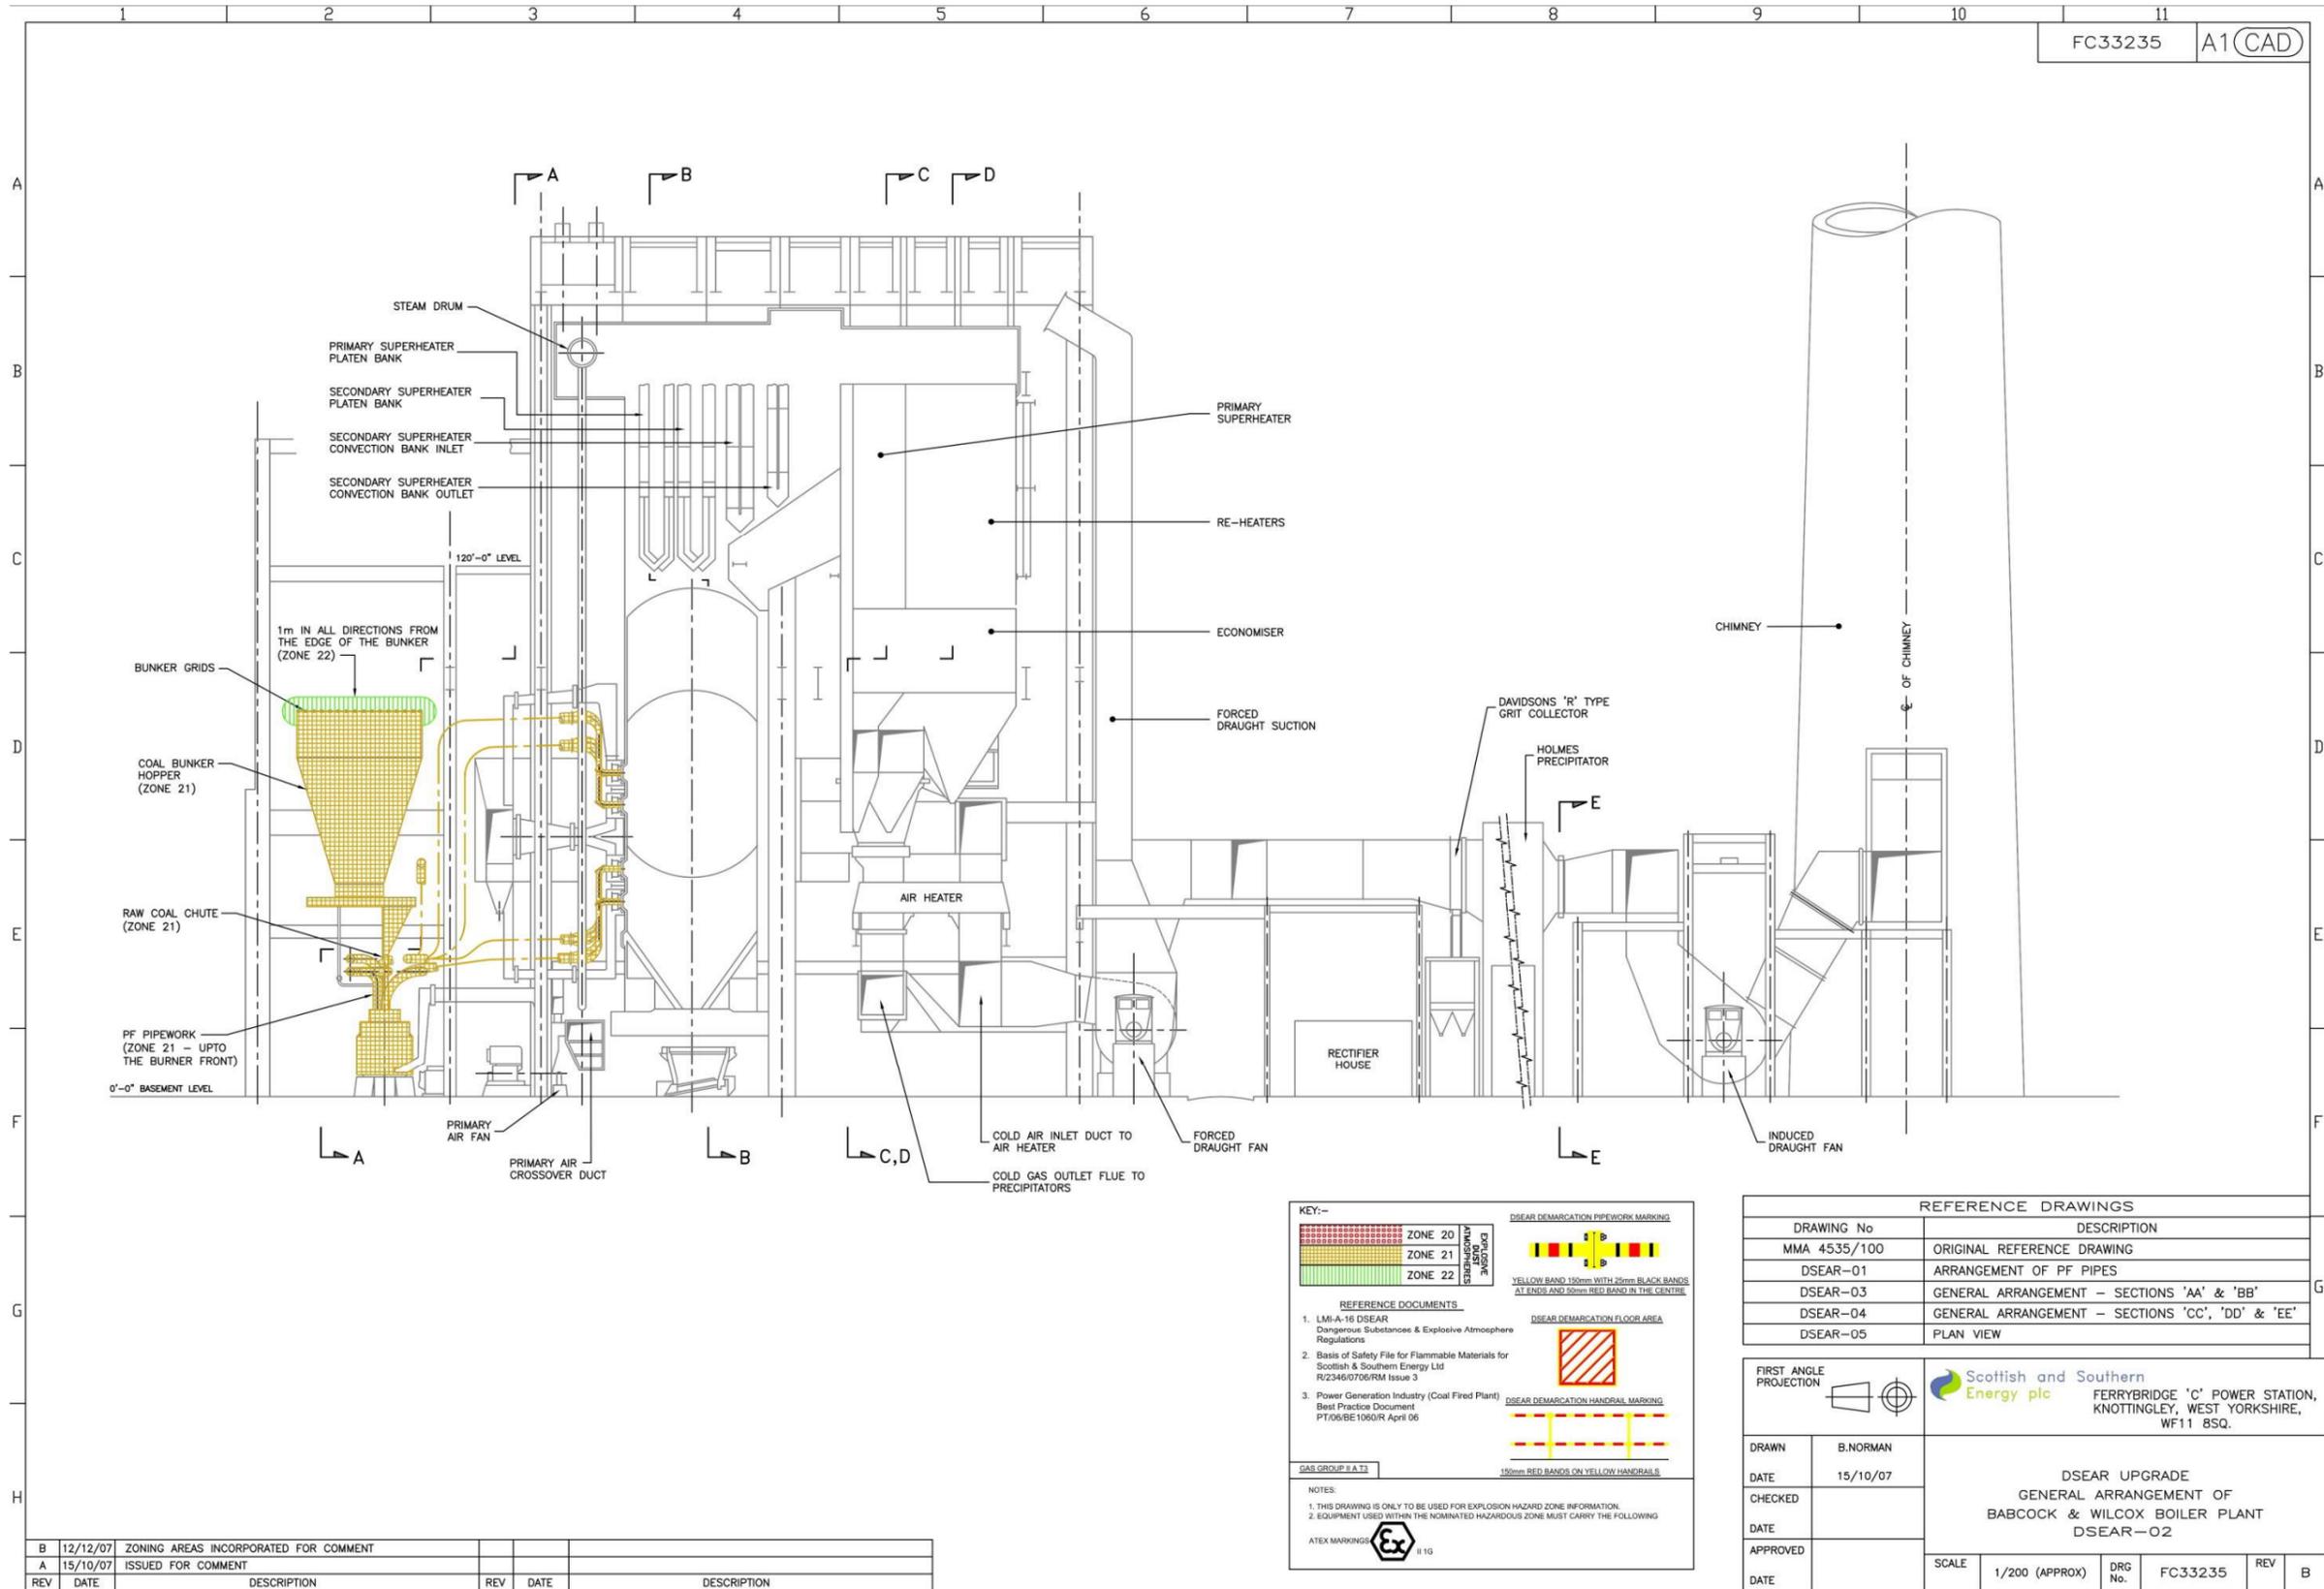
Elevation of the Mill Bay, Boiler Plan, Precipitators and Chimney.
